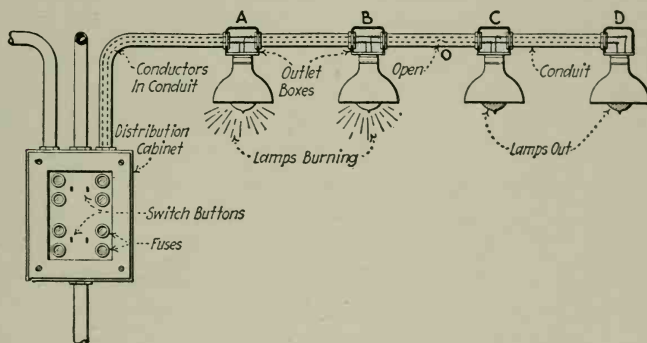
Diagram showing an open in a conduit system. The open exists between outlet box B and C, as shown at O. To repair the fault, the conductors must be pulled out of the conduit between outlet boxes B and C and the faulty conductor replaced with a new conductor.
